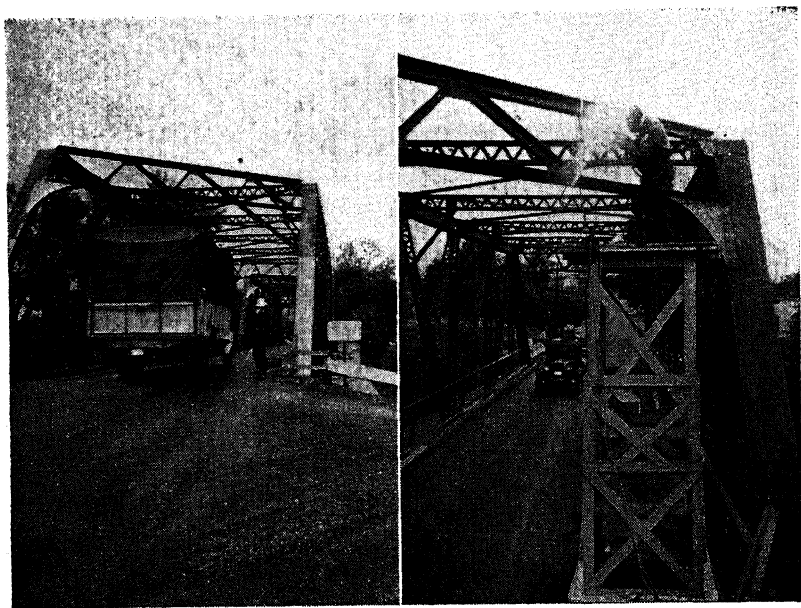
Tall trucks occasionally hit the braces of old bridges such as this. The braces are being replaced with welded-on gusset plates such as shown at the left. This adds $7\frac{1}{2}$ feet more clearance. One of the old braces is shown on the right-hand side of the illustration at the left.
